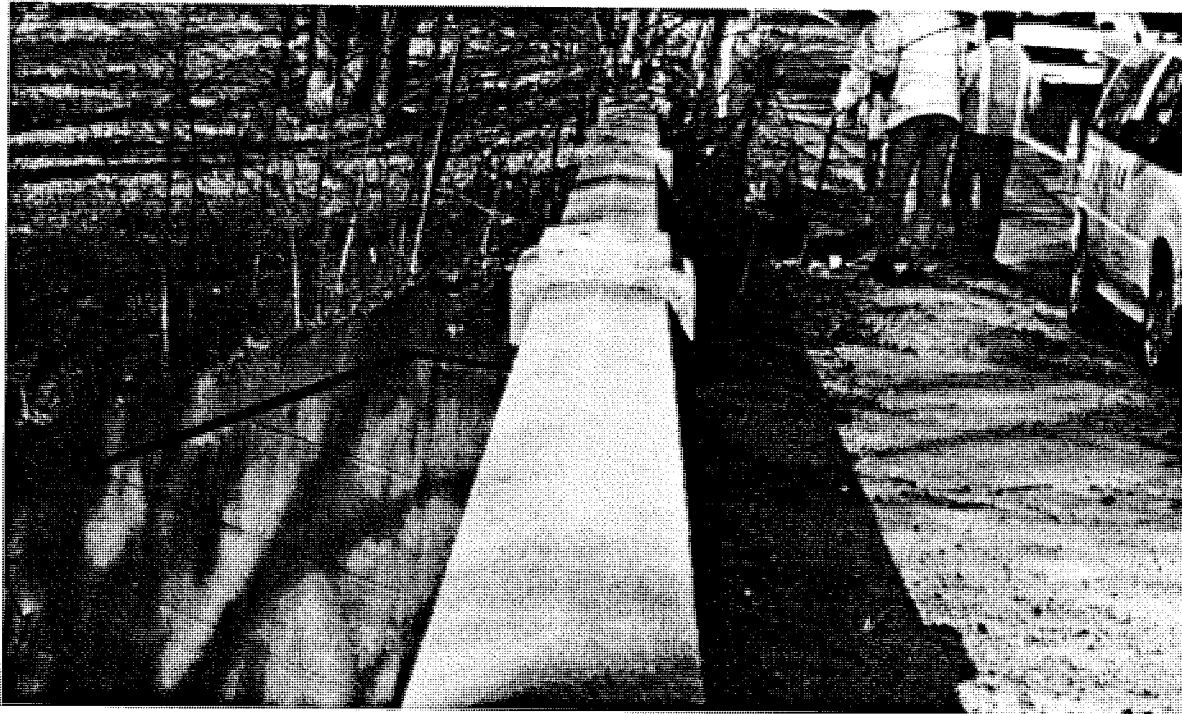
Photograph of Bridge No. 0324-158, Route 206 over Rancocas Creek, Pemberton Twp., Burlington County, New Jersey.
